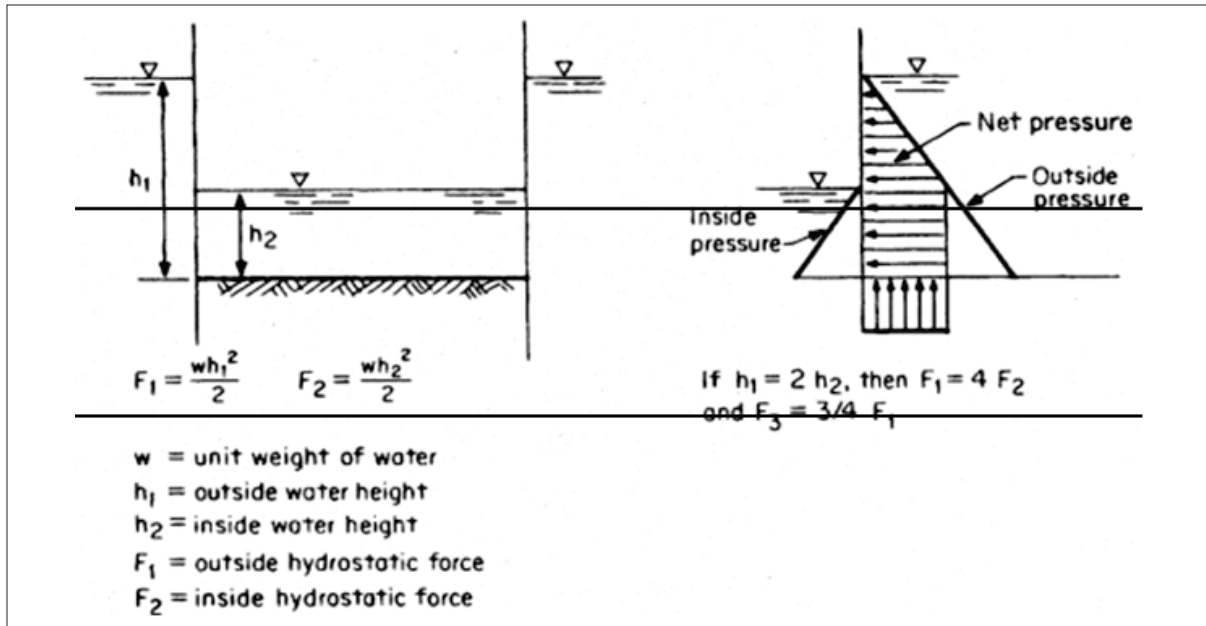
Hydrostatic Force/Load (Partially Dewatered Structure)
